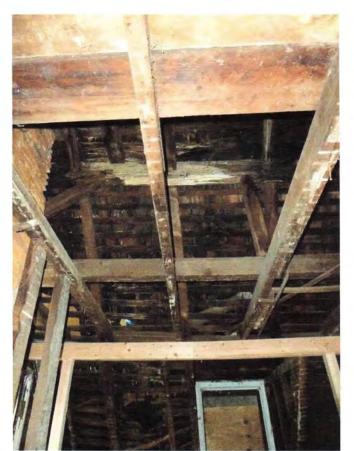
General view of roof framing, looking south at east end of south slope of roof.
